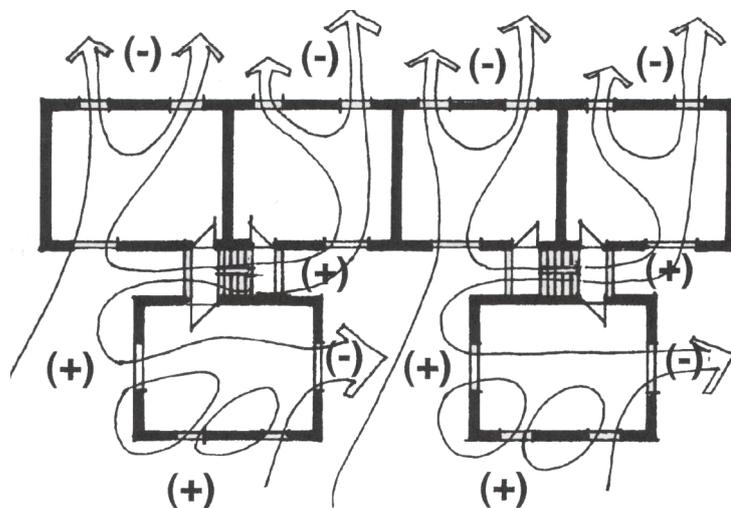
Ventilation potential in direct-access building with external staircase (type -2)
